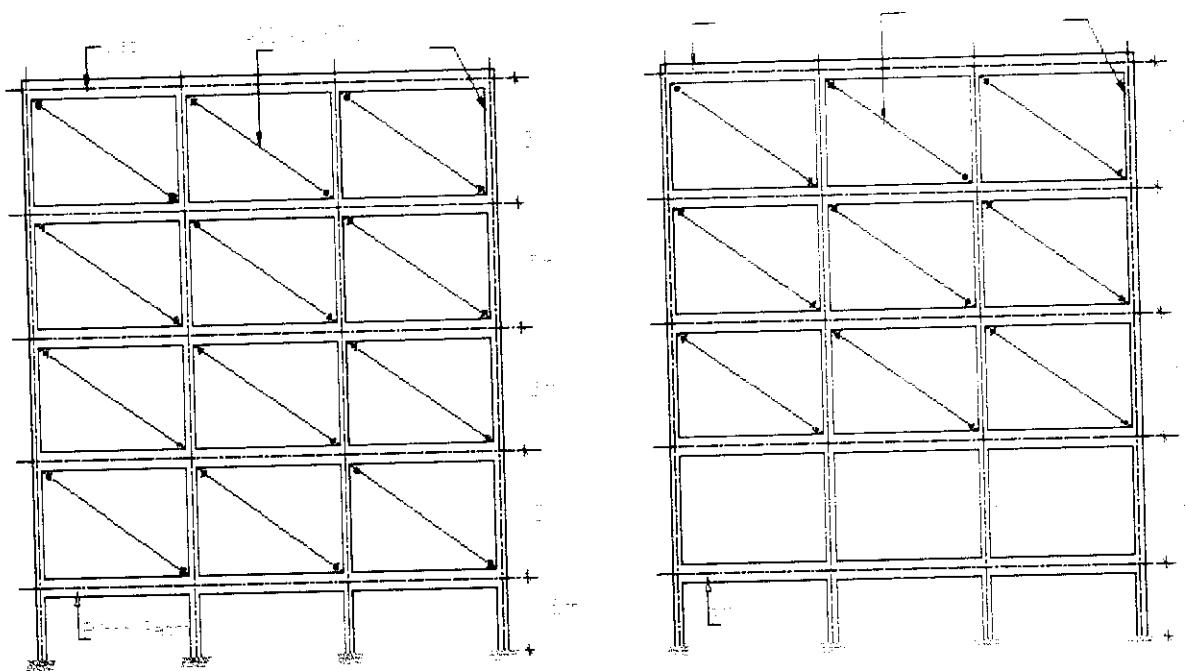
Typical RC Frame showing with and without open Ground Storey
